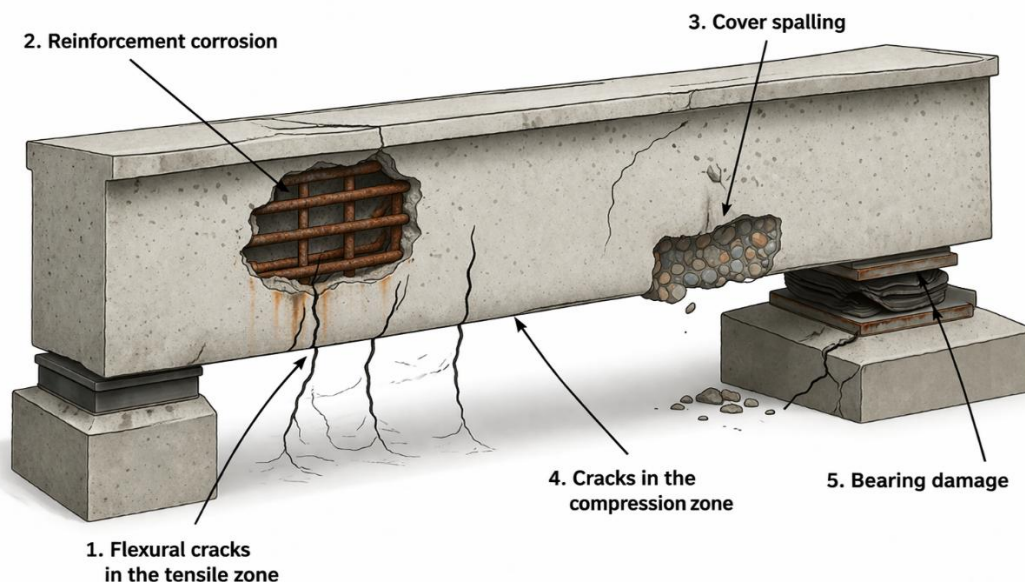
Typical defect locations in a reinforced concrete beam of a bridge superstructure: 1 – flexural cracks in the tensile zone; 2 – corrosion of main reinforcement; 3 – spalling of concrete cover; 4 – cracks in the compression zone; 5 – bearing damage.
